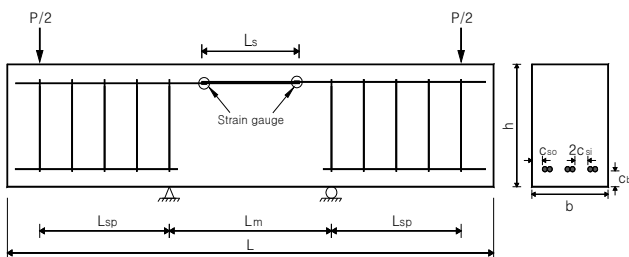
Schematic of lap splice beam test specimen (Choi et al, 2012)
